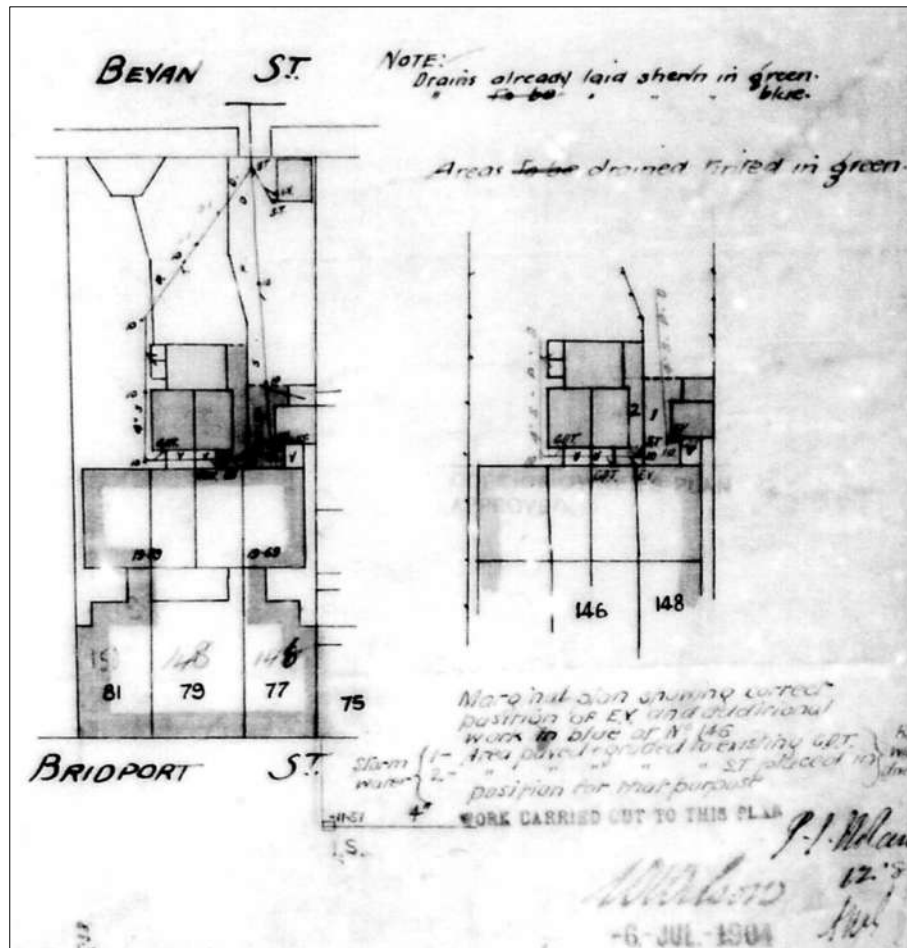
Property service plan, showing the footprint of the subject building in 1904 following the construction of the existing shopfronts.
